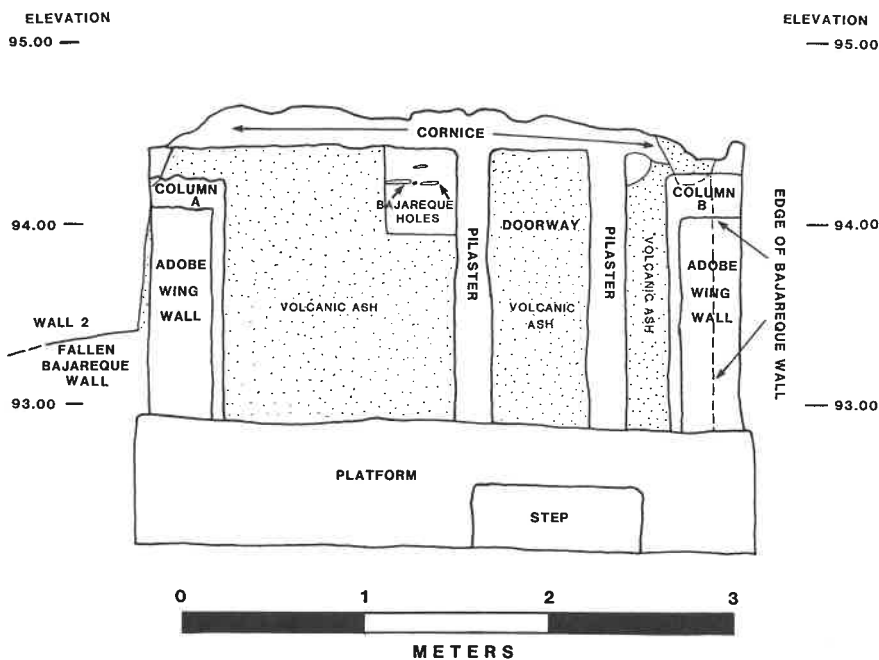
Profile of north wall (Wall 1) of Structure 2a, looking south. Volcanic ash left to support wall and doorway. Drawing by Brian McKee.
